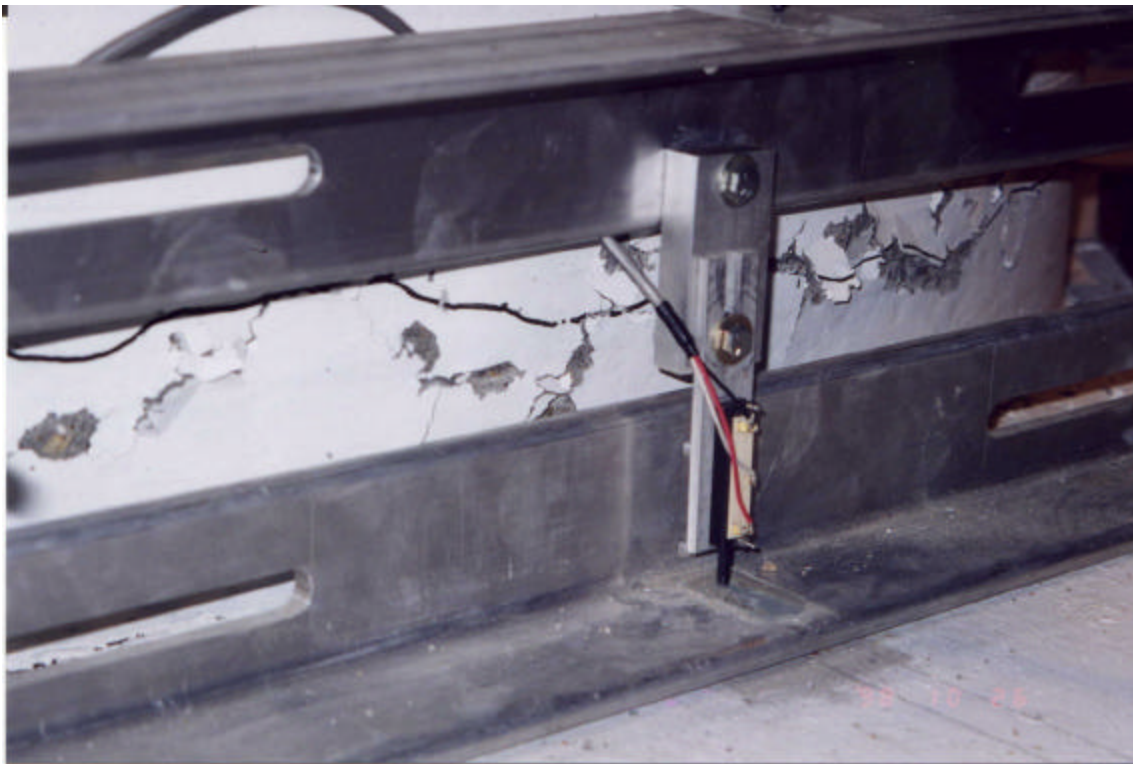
Unit HS2 Concrete Spalling on Compression Zone, Outside Surface at $\mu_{\Delta} = 2.0$
